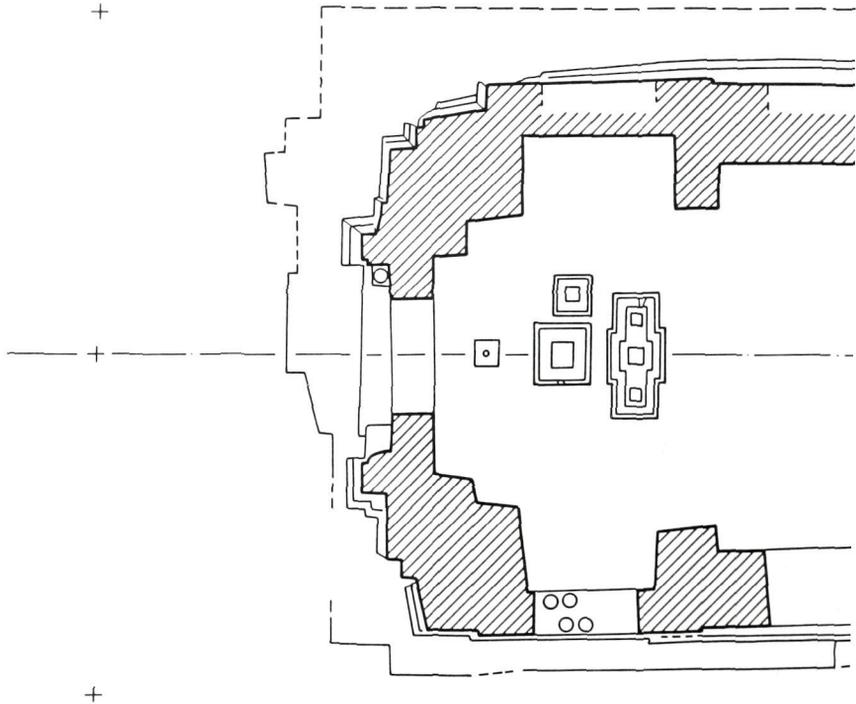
Plan of Preah Khan (after J Boisselier 1966).
